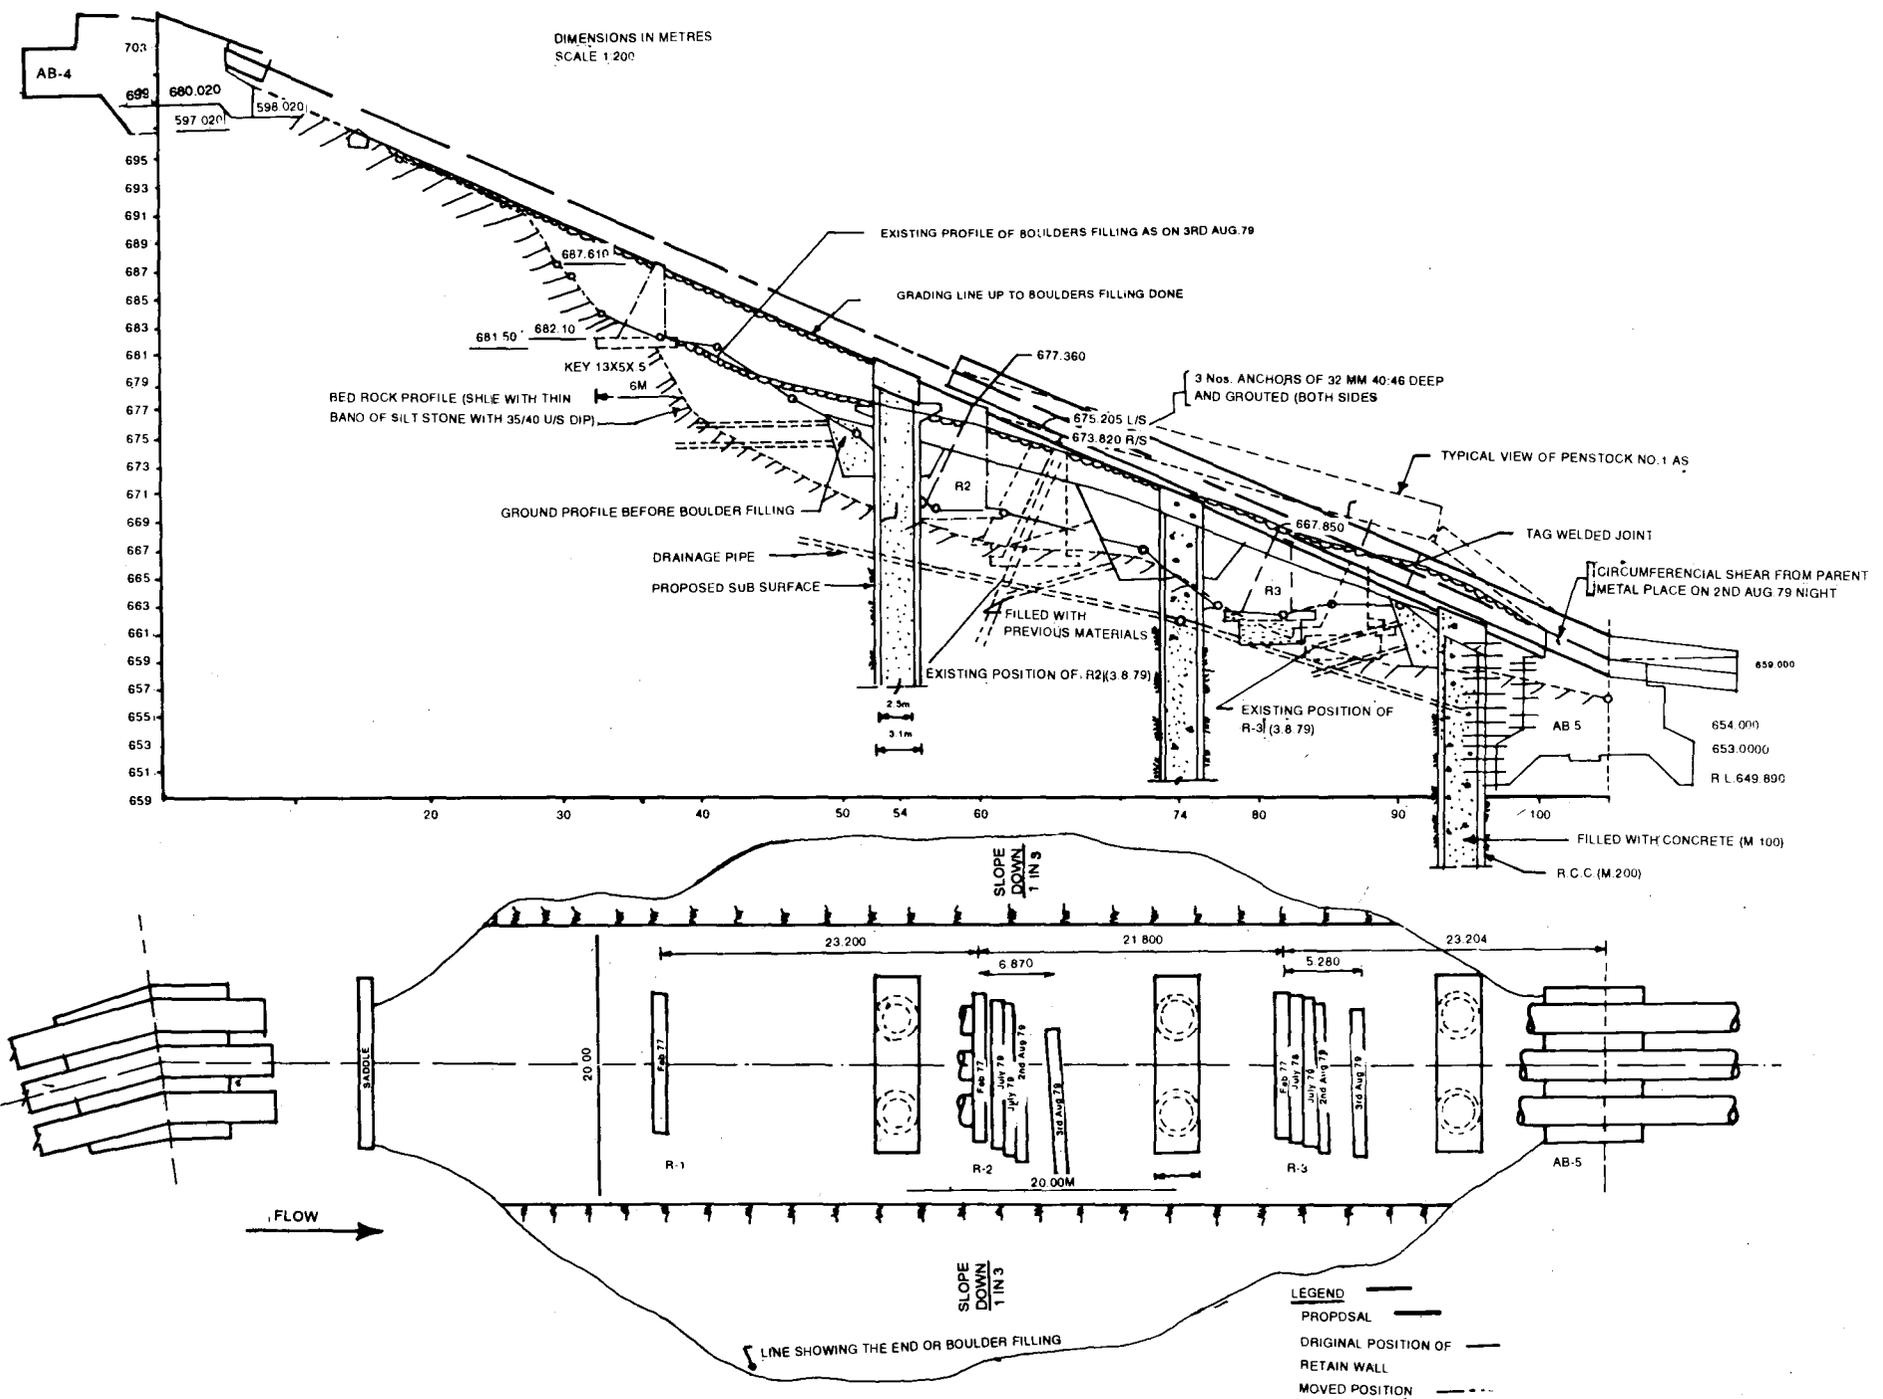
Loktak Hydro-electric Project, Manipur, Plan and longitudinal section of reach anchor block (4-5), showing the details of movement of retaining walls and proposed shafts and drainage
